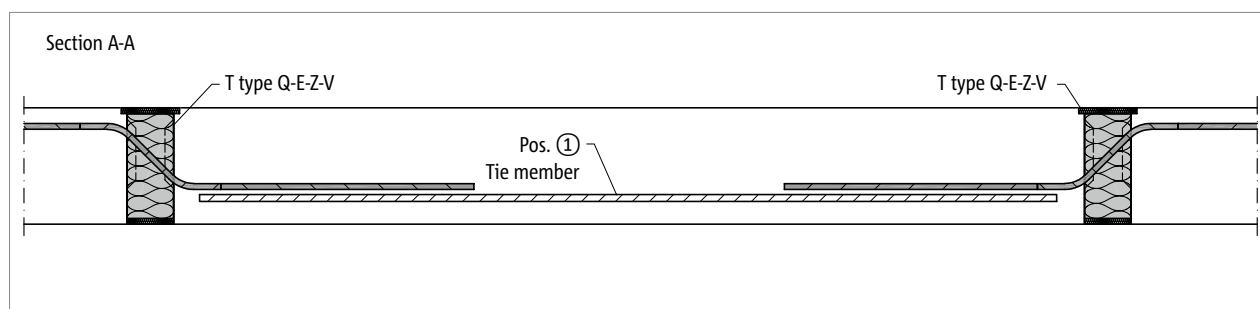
Schöck Isokorb® T type Q-E-Z-V: Tie member connection
